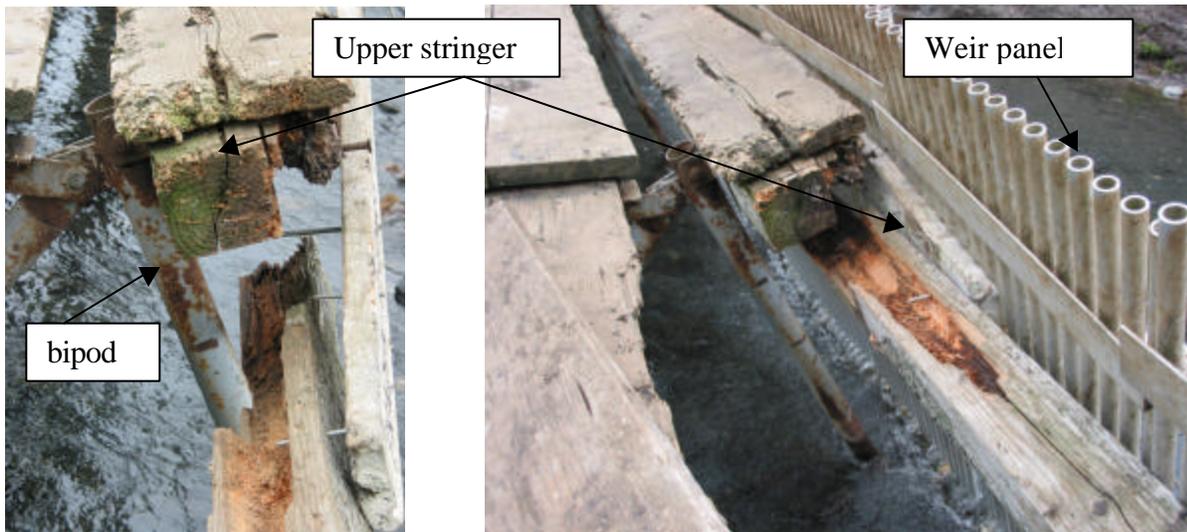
Broken pieces on upper stringer on lower diversion weir, Frazer Lake, 2001.
